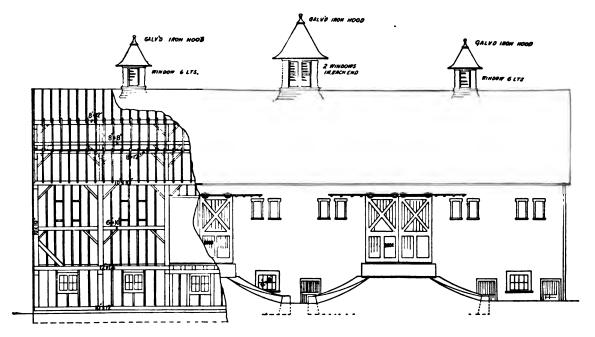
WHITEHALL FARM BARN (INTERIOR CONSTRUCTION).
